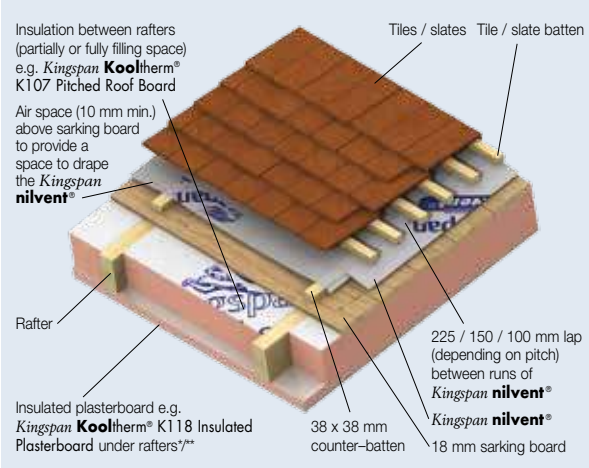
Insulation Between Rafters – Sarking Board – Battens & Tiles
